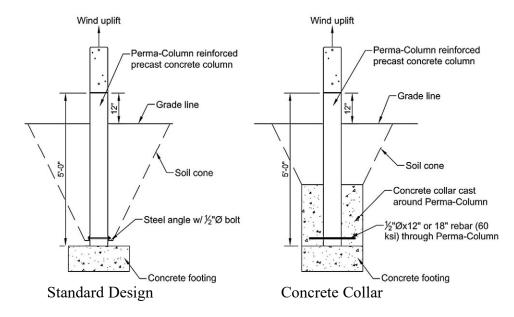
Standard Foundation and Foundation with Concrete Collar
